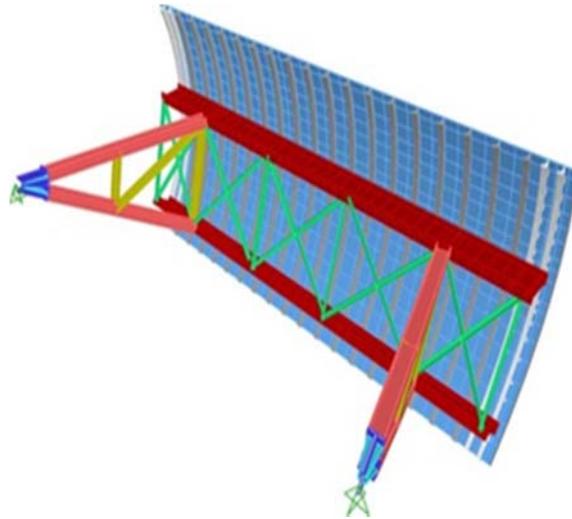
Schematic of Steel Gates and Steel Pile Structure
